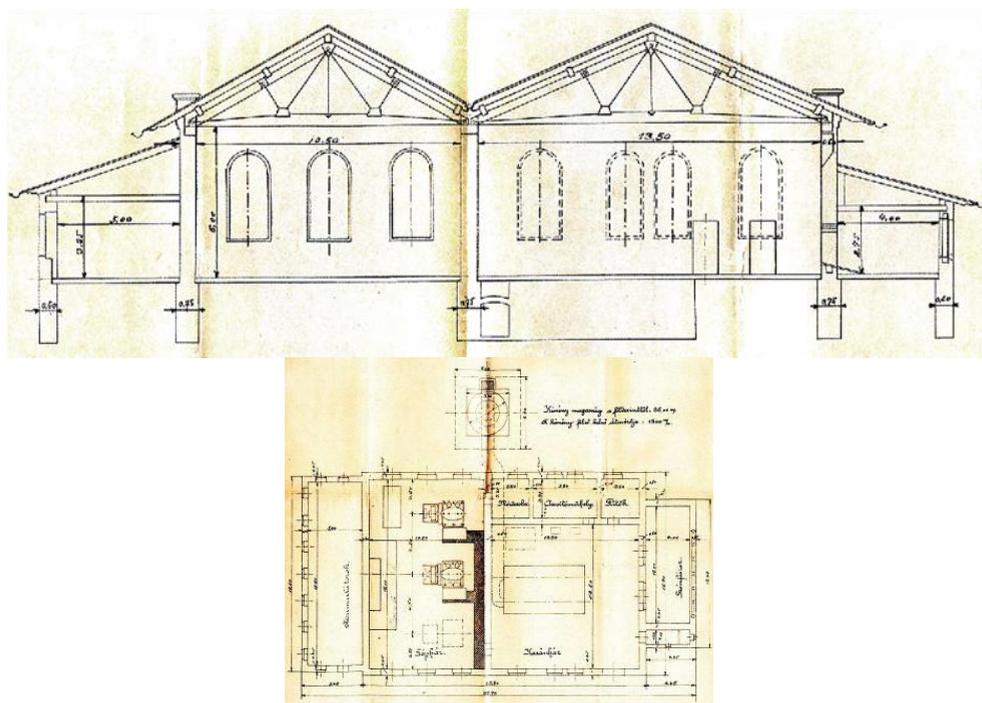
Steam Power Plant drawing, section and a ground plan. Source: State Archives Žilina.
